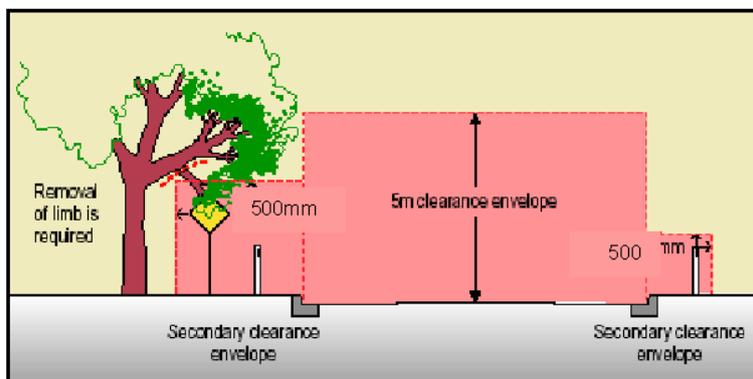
Secondary Clearance Envelope around existing roadside furniture
